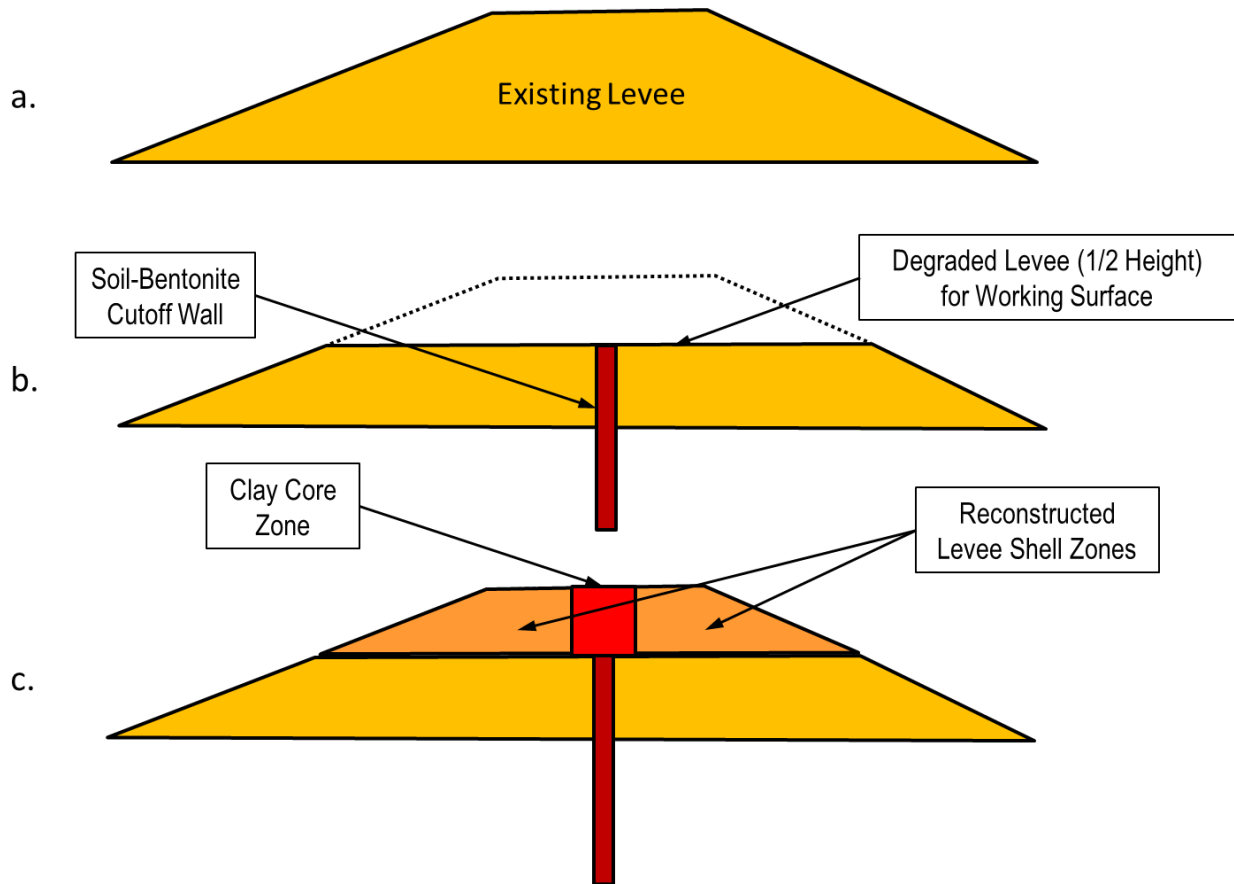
Schematic Sequence of Cutoff Wall Construction and Levee Reconstruction
